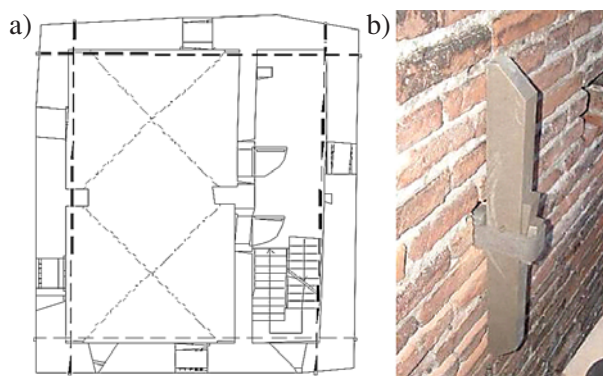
Strengthening interventions, positioning of stainless steel ties, Vanga tower (Trento): a) tie positioning, plan; b) view of the external anchor
